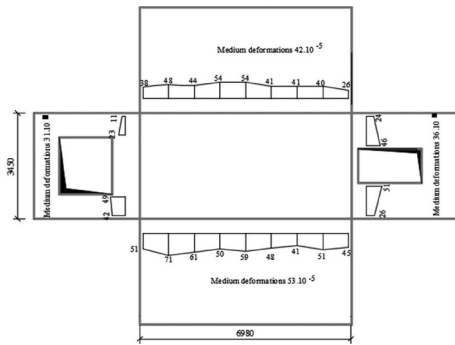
Distribution of concrete compression strains along the perimeter of the walls of block No. 1 at 76% of the breaking load.
